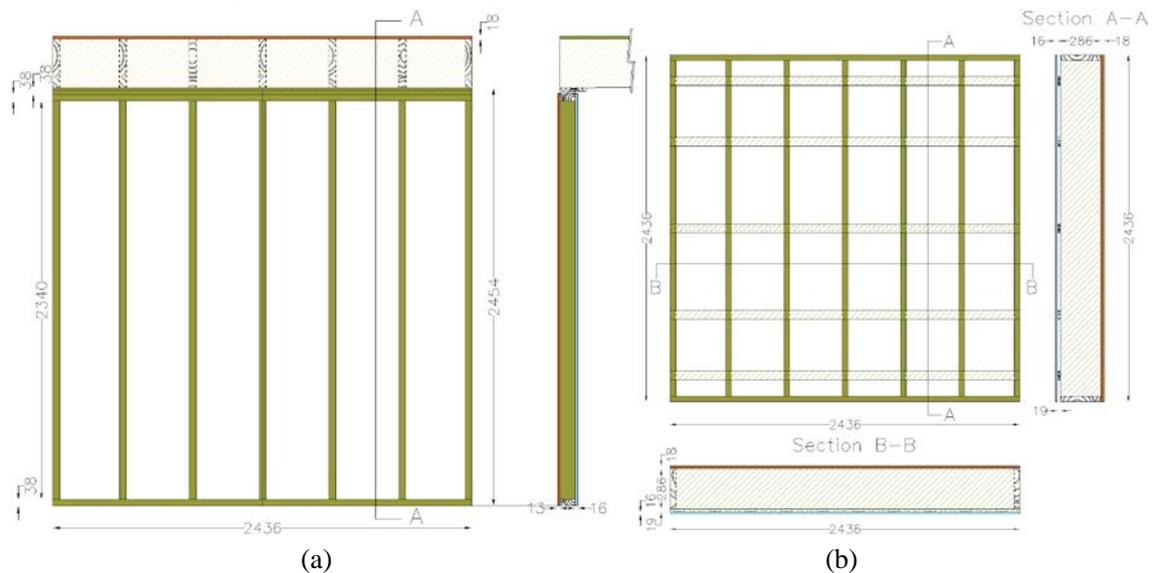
Framing for test specimen WOOD01 (a) Wall (b) Diaphragm
